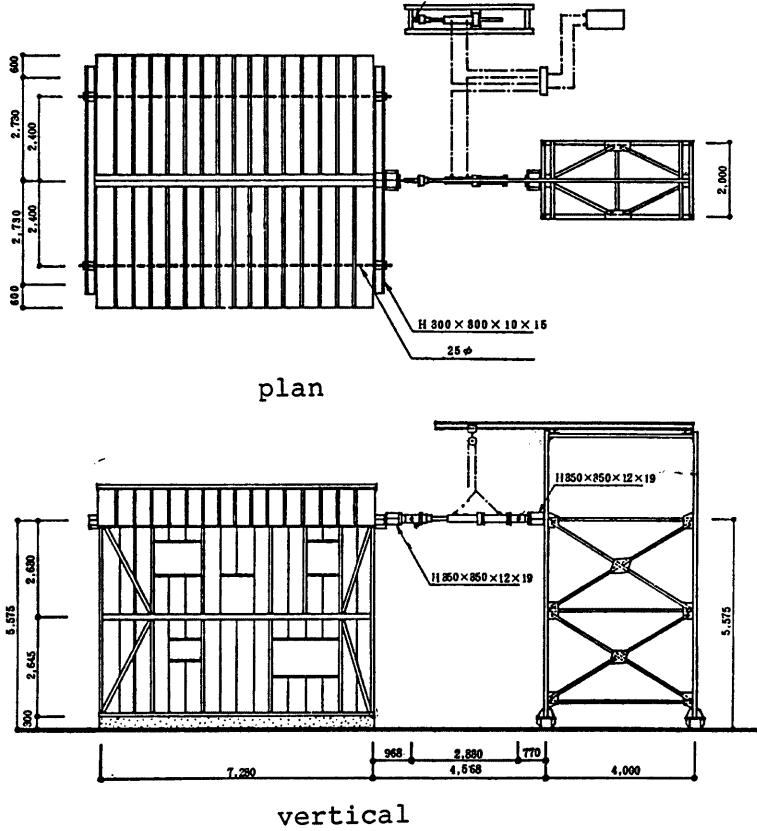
Plan and vertical views of typical wooden Japanese test house⁵⁾
